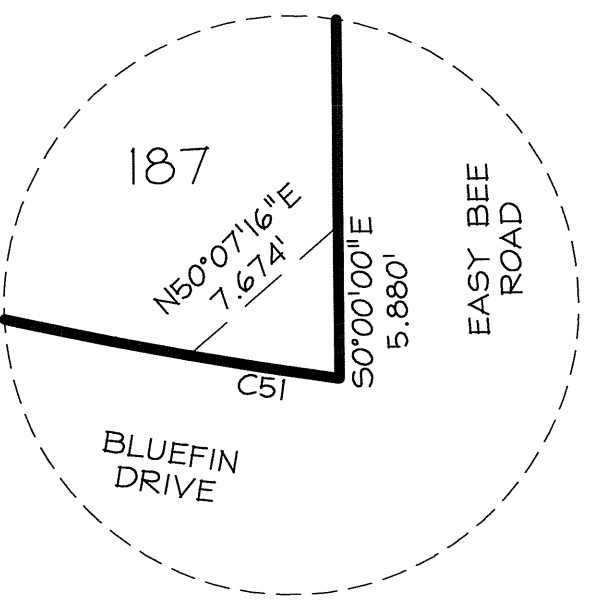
DETAILS "A" THROUGH "C" - SIDEWALK EASEMENTS FOR
